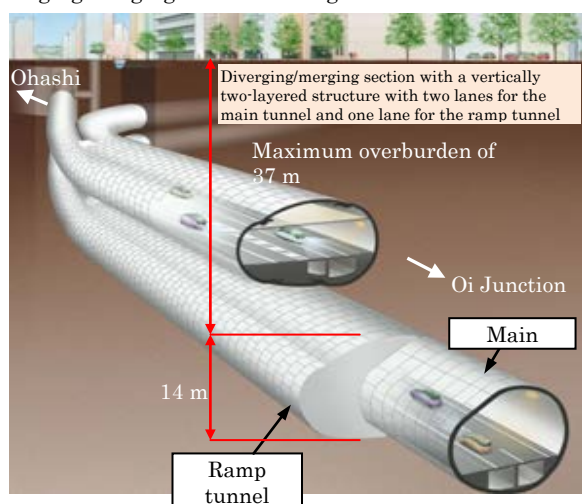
Outline of Ohashi Ramp Construction for the Central Circular Shinagawa Route
